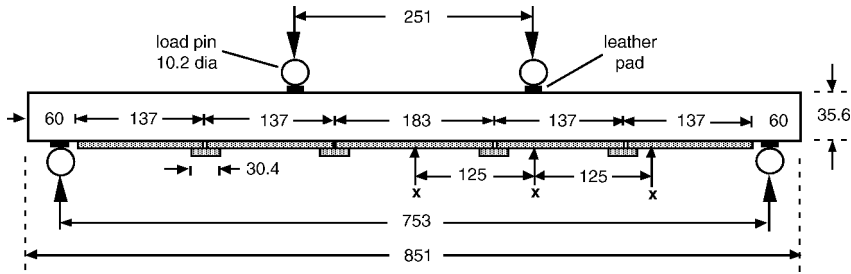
Experimental set-up for flexural testing of 8.5-m concrete beam with bonded composite plates (all dimensions in cm).
